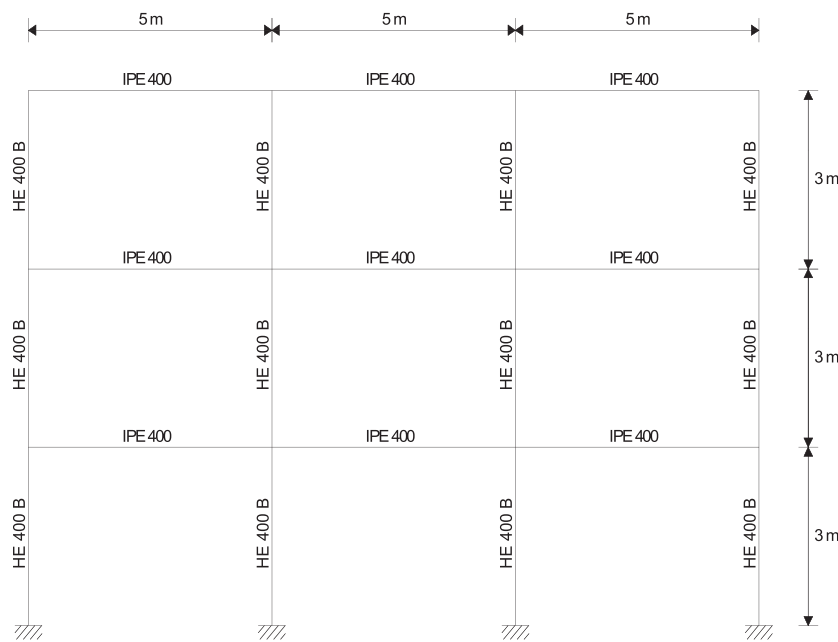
Steel frame of Section 3.2. For each floor, added mass 2850 kg/m. In the finite element model, damping coefficient 0.5 %.
